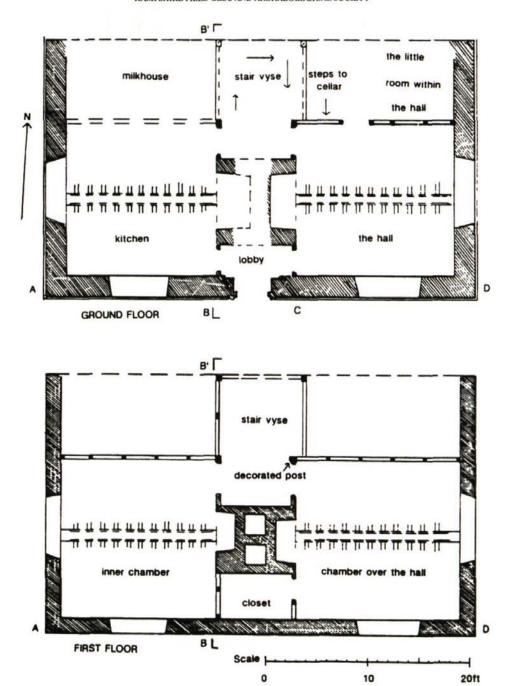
Ground and first-floor plans of Hensting Farmhouse. The outer wall of the outshot has been largely destroyed and is marked with a broken line. Later additions have been omitted. Masonry walls are shown hatched; timber studs (between brick panels) are shown black.
